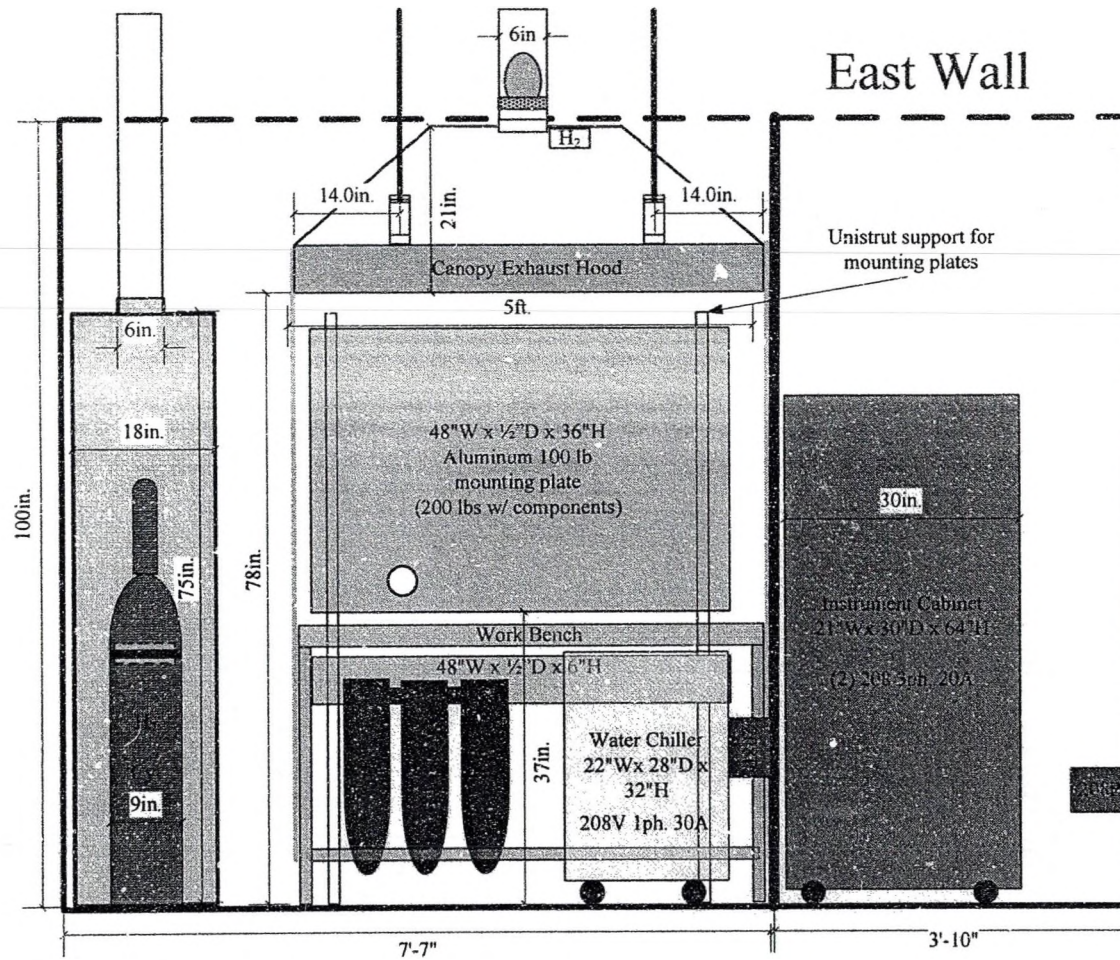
Upson 360A east wall canopy hood, instrument rack, cylinder cabinet and major component locations.
